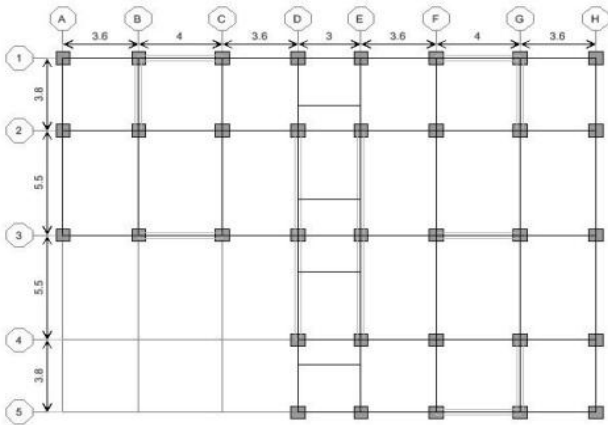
Sixth to tenth Floor Plan (ST 6 to 10)
